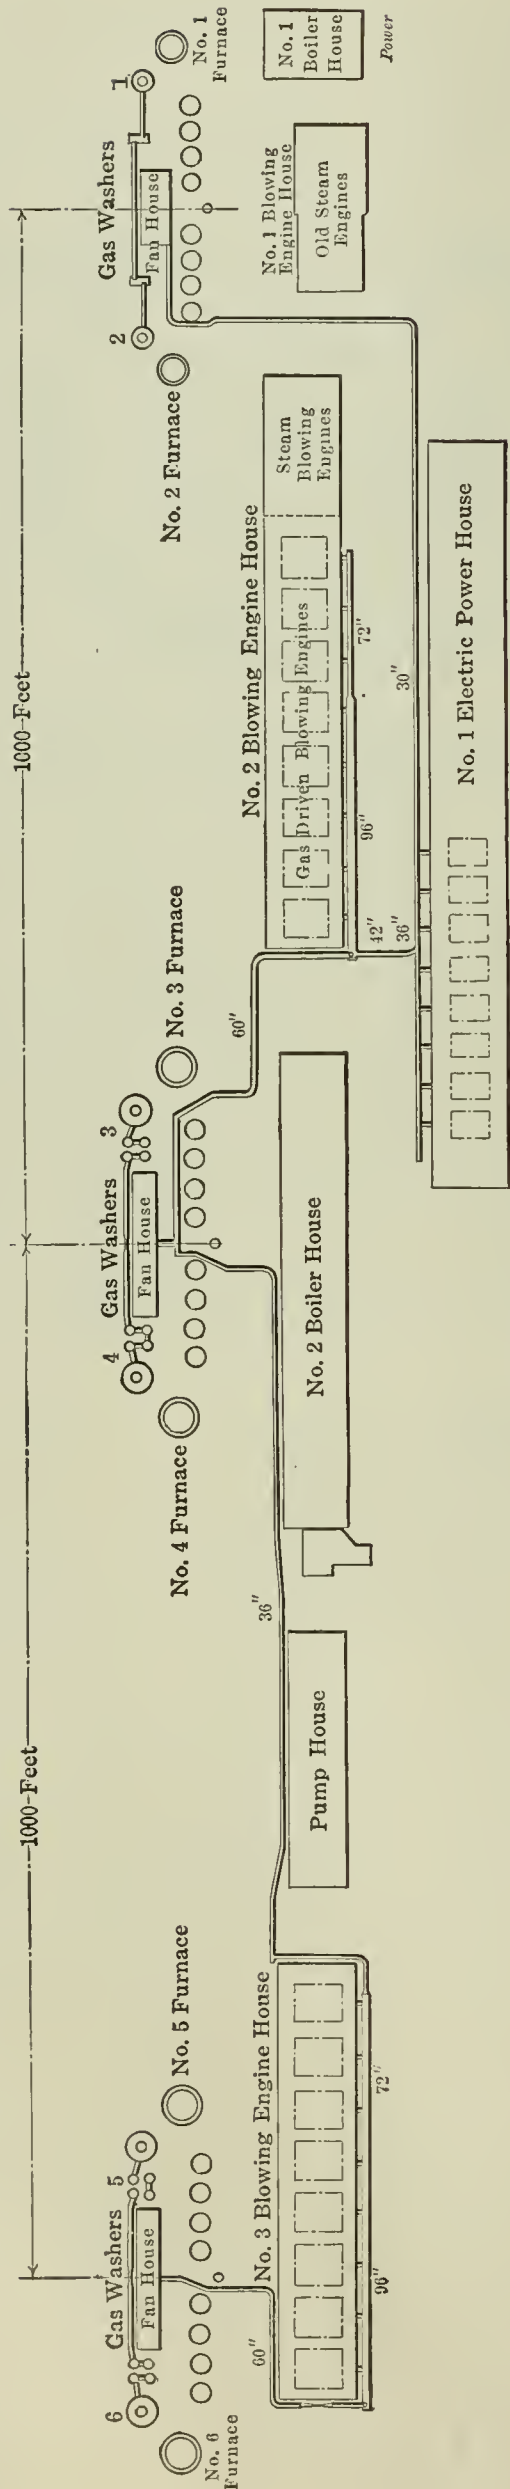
PLAN DIAGRAM OF FURNACES, WASHERS AND POWER HOUSES OF LACKAWANNA STEEL WORKS
